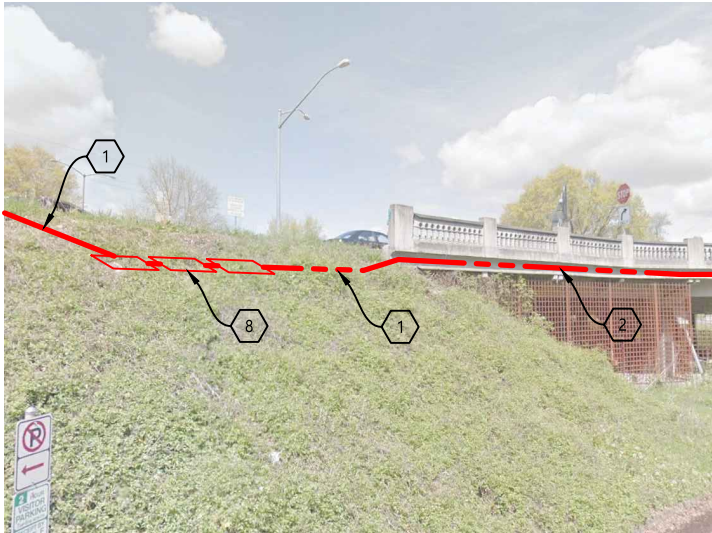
FACING WEST ON SOUTH SIDE OF ROSS ISLAND BRIDGE
